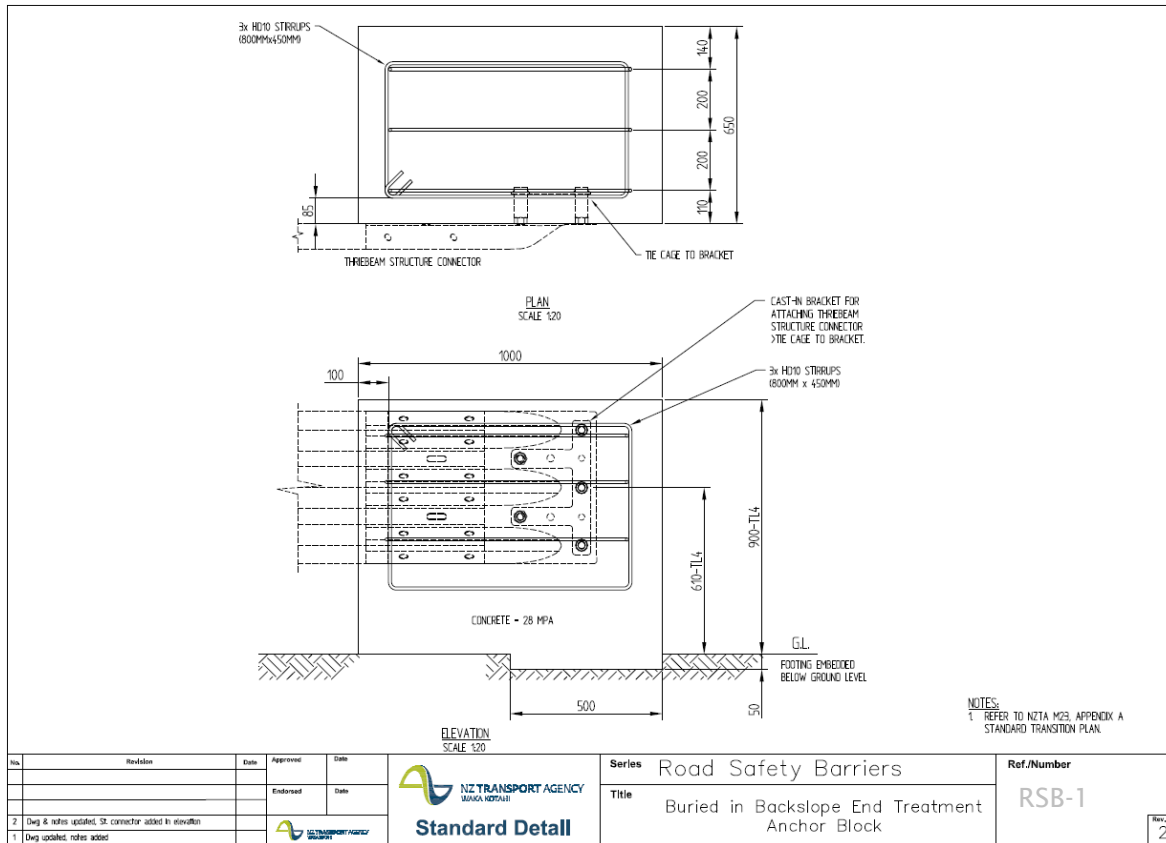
NZTA Accepted Detail Buried in Backslope Anchor Block
